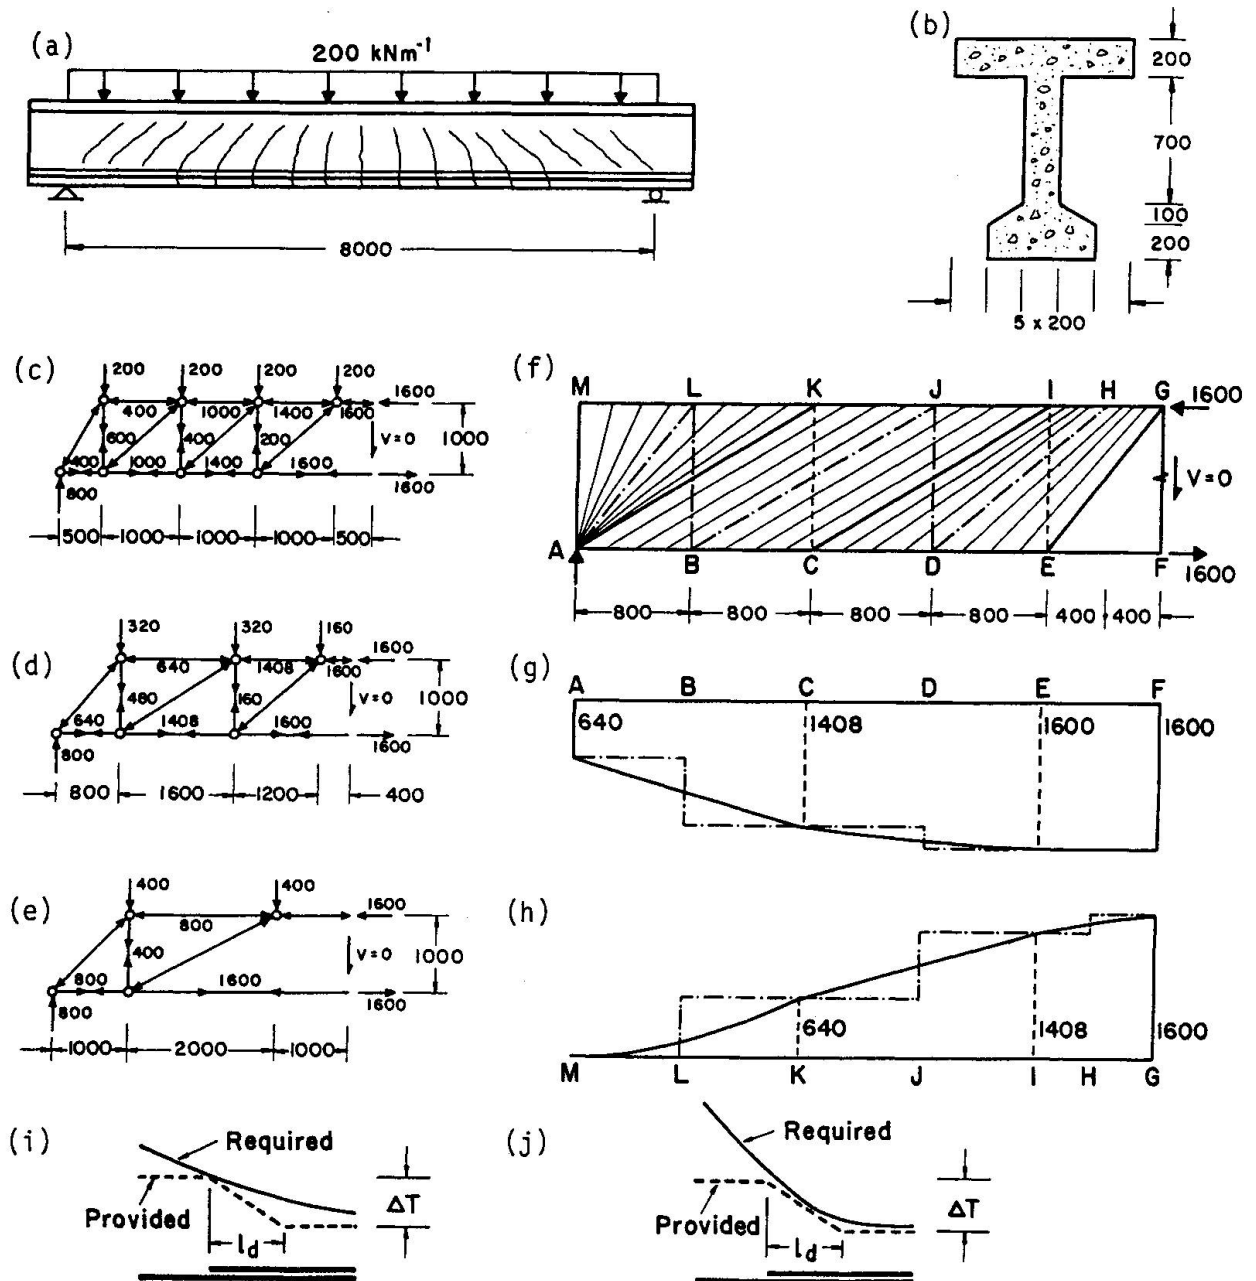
Uniformly loaded I-beam: (a) Loading and crack pattern; (b) Cross-section; (c) through (e) Truss models; (f) Discontinuous stress field; (g) Required factored resistance of bottom chord; (h) Factored top chord force; (i) Critical condition at bar cutoff; (j) Critical condition within development length.
